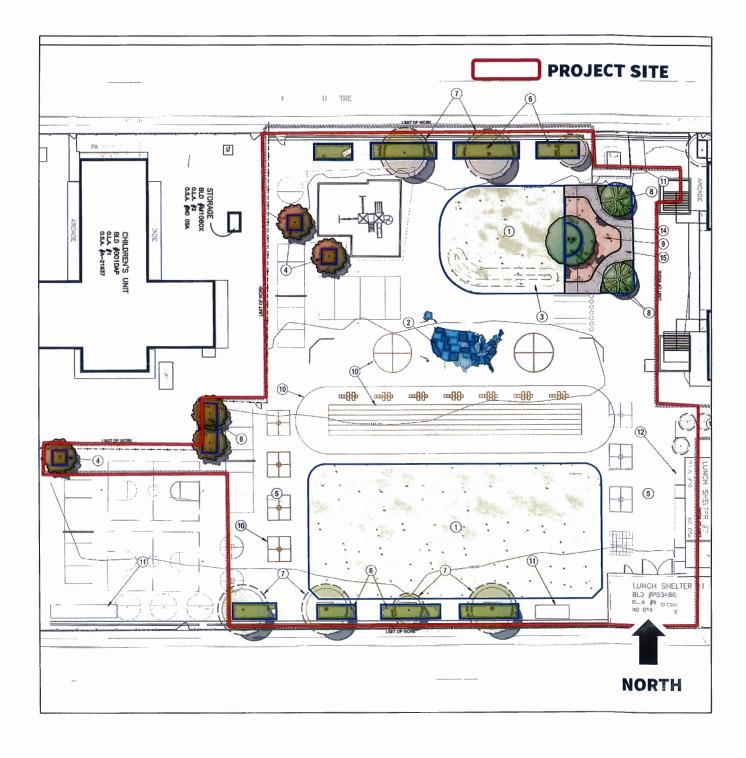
h STREET ES SITE PLAN (not to scale)
